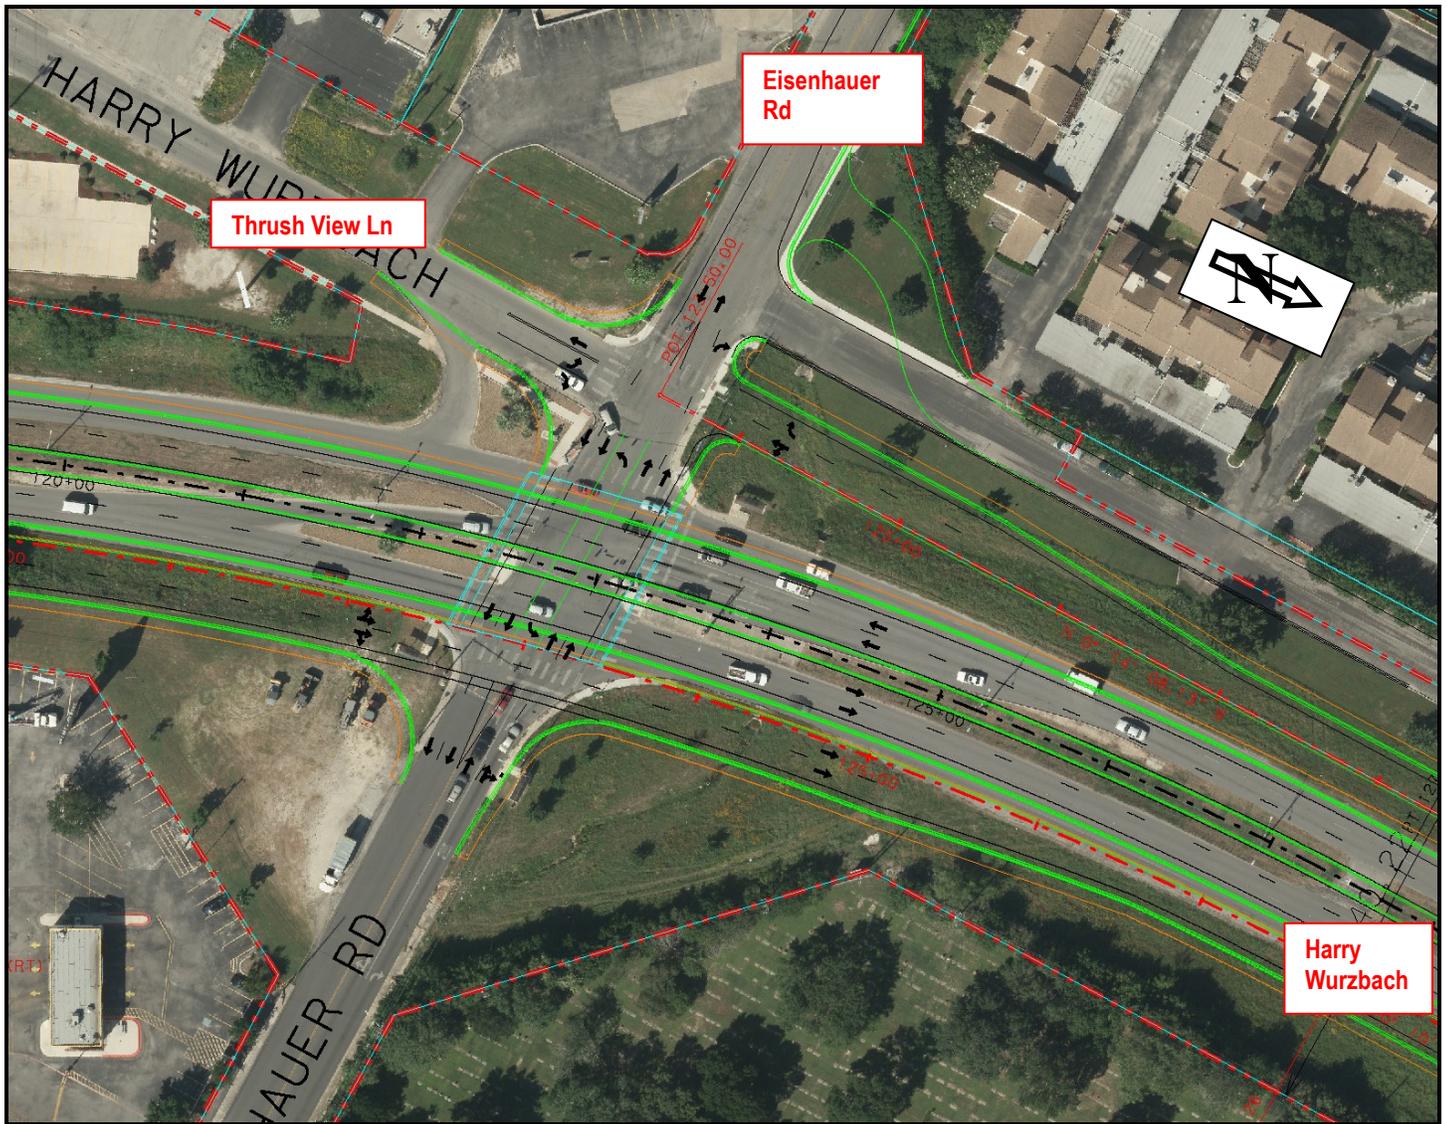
Proposed Improvements for Harry Wurzbach (below-grade) at Eisenhauer Rd (at-grade) intersection
